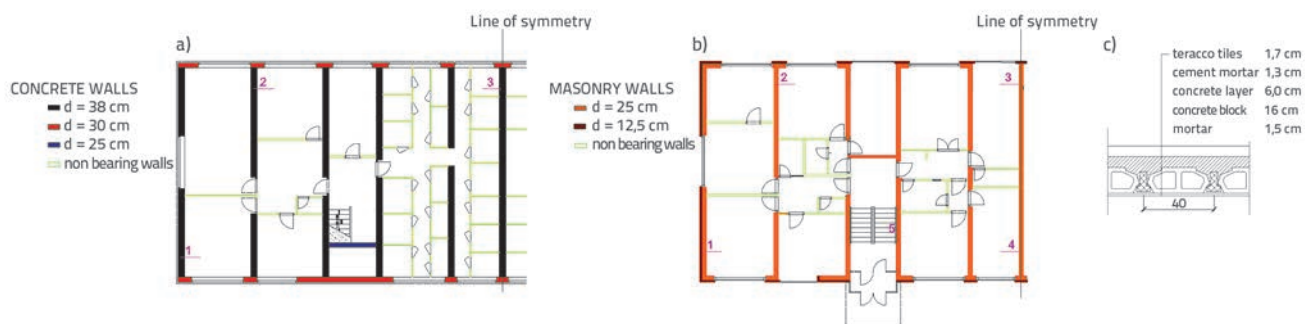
a) Floor plan of the studied building; b) plan view of the basement; c) "Herbst" elements
